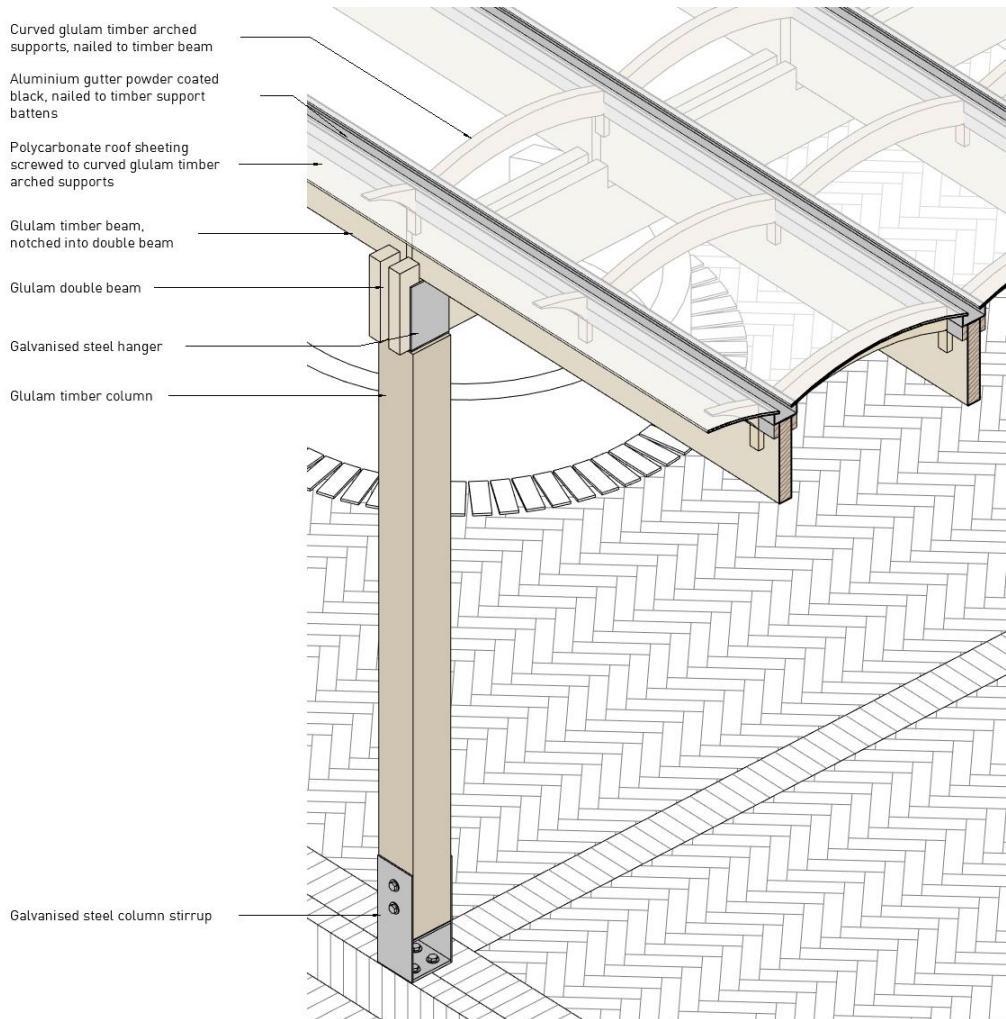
Concrete and timber beams support joists and timber arches under semi-translucent sheeting (Author 2022)
